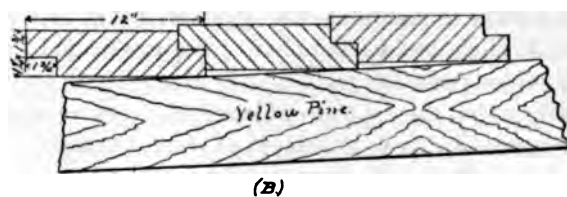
CROSS-SECTIONS OF SHEET PILING.
